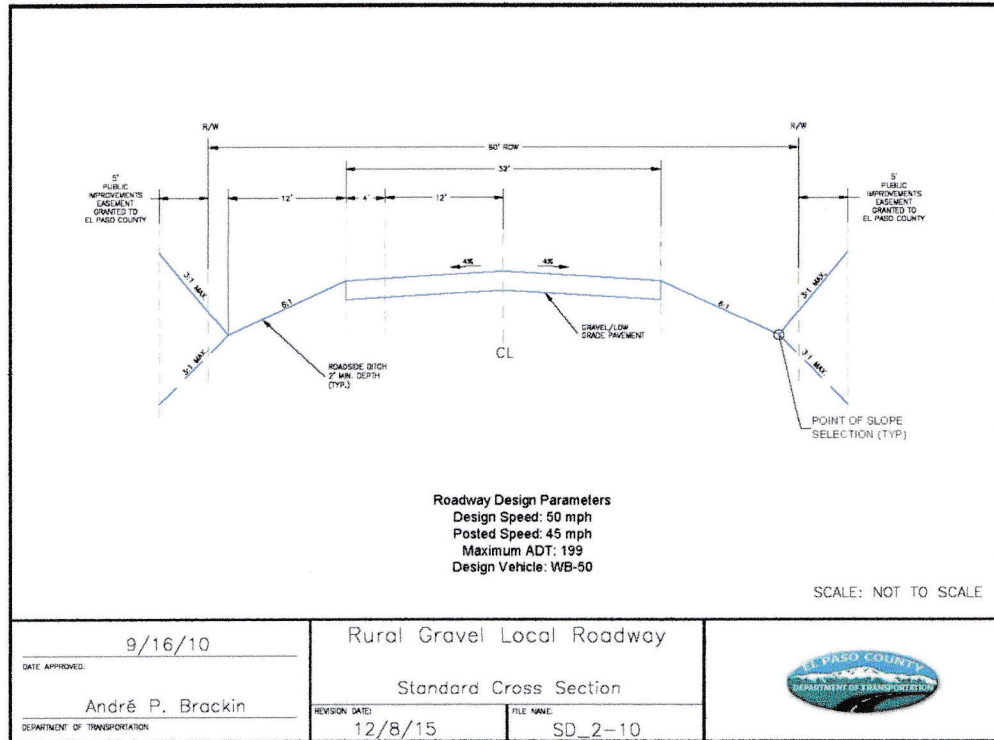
Road profile from the ECM showing assumptions used in the calculation of surface area fed to 16-inch existing culvert.
